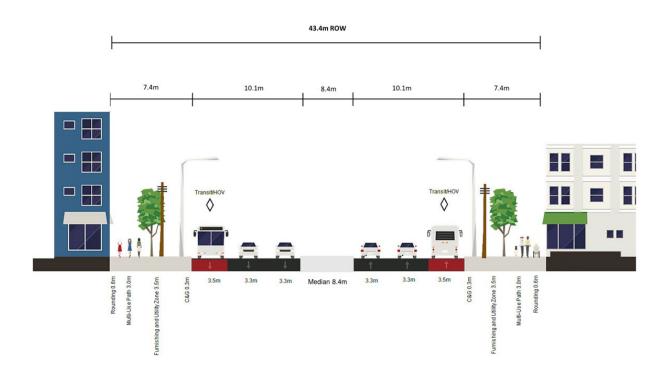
RECOMMENDED Intersection Typical Section – Six Lanes for Transit / HOV with AT facilities for Future Conversion
